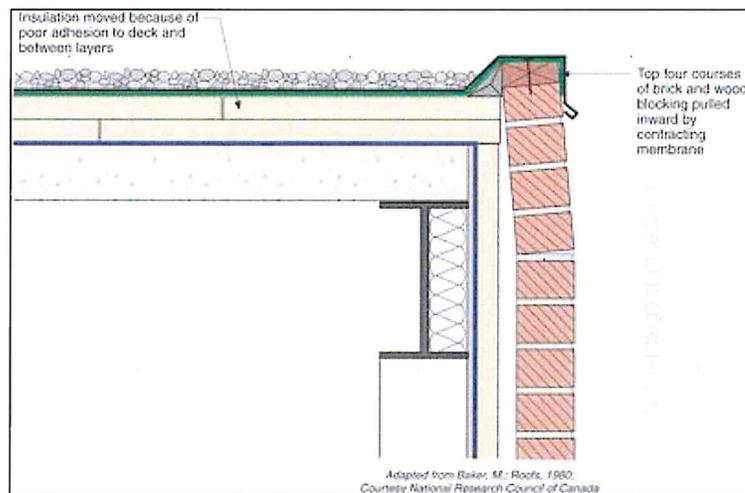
BSI-050 – Parapets – Where Roofs Meet Walls.
